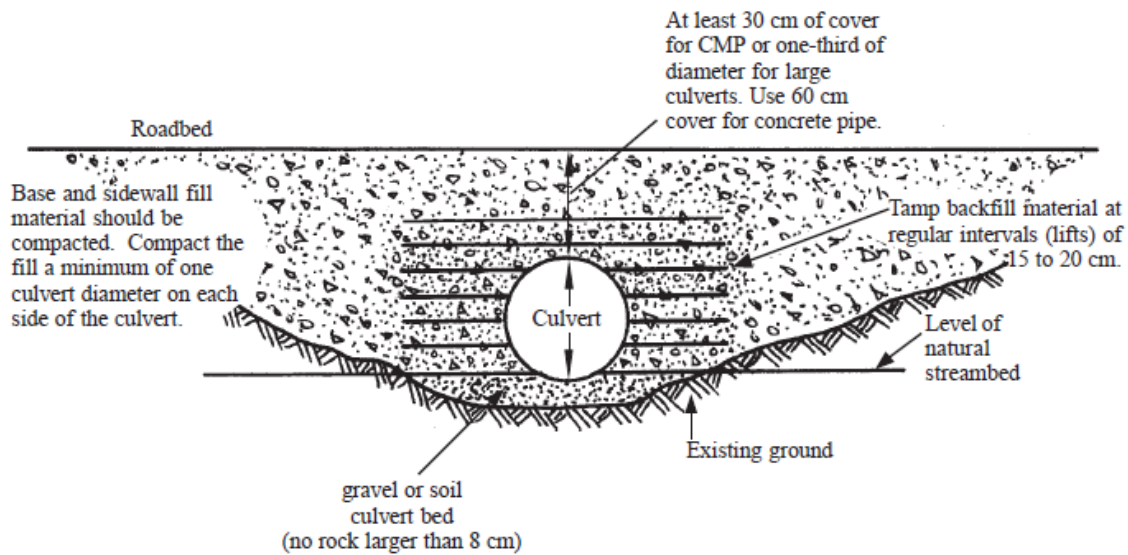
Culvert Backfill and Compaction (Keller 2003)
